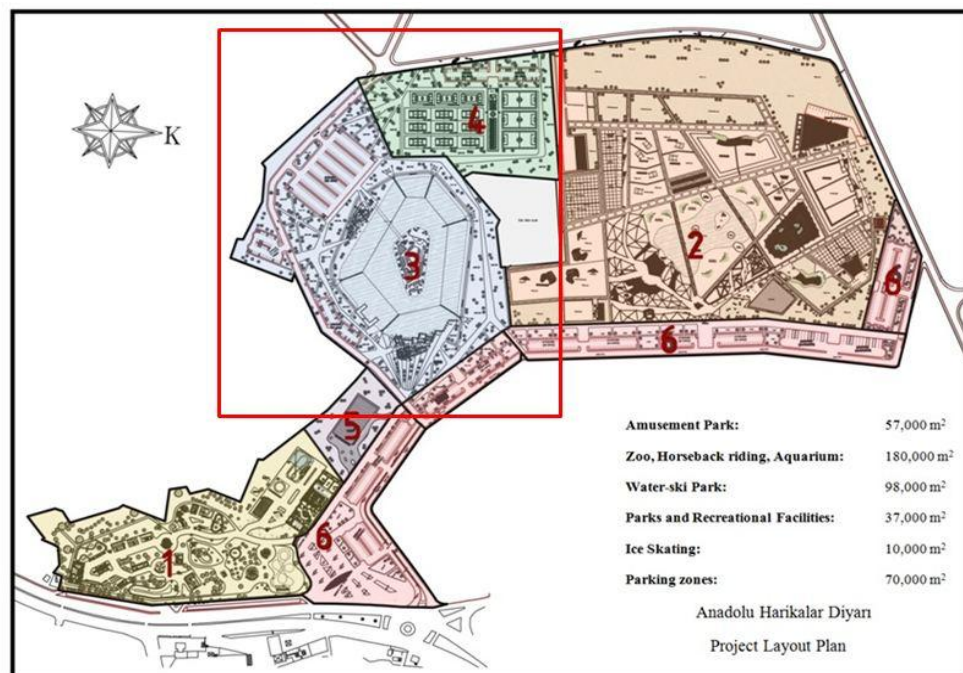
Anadolu Harikalar Diyarı Project Layout Plan.
